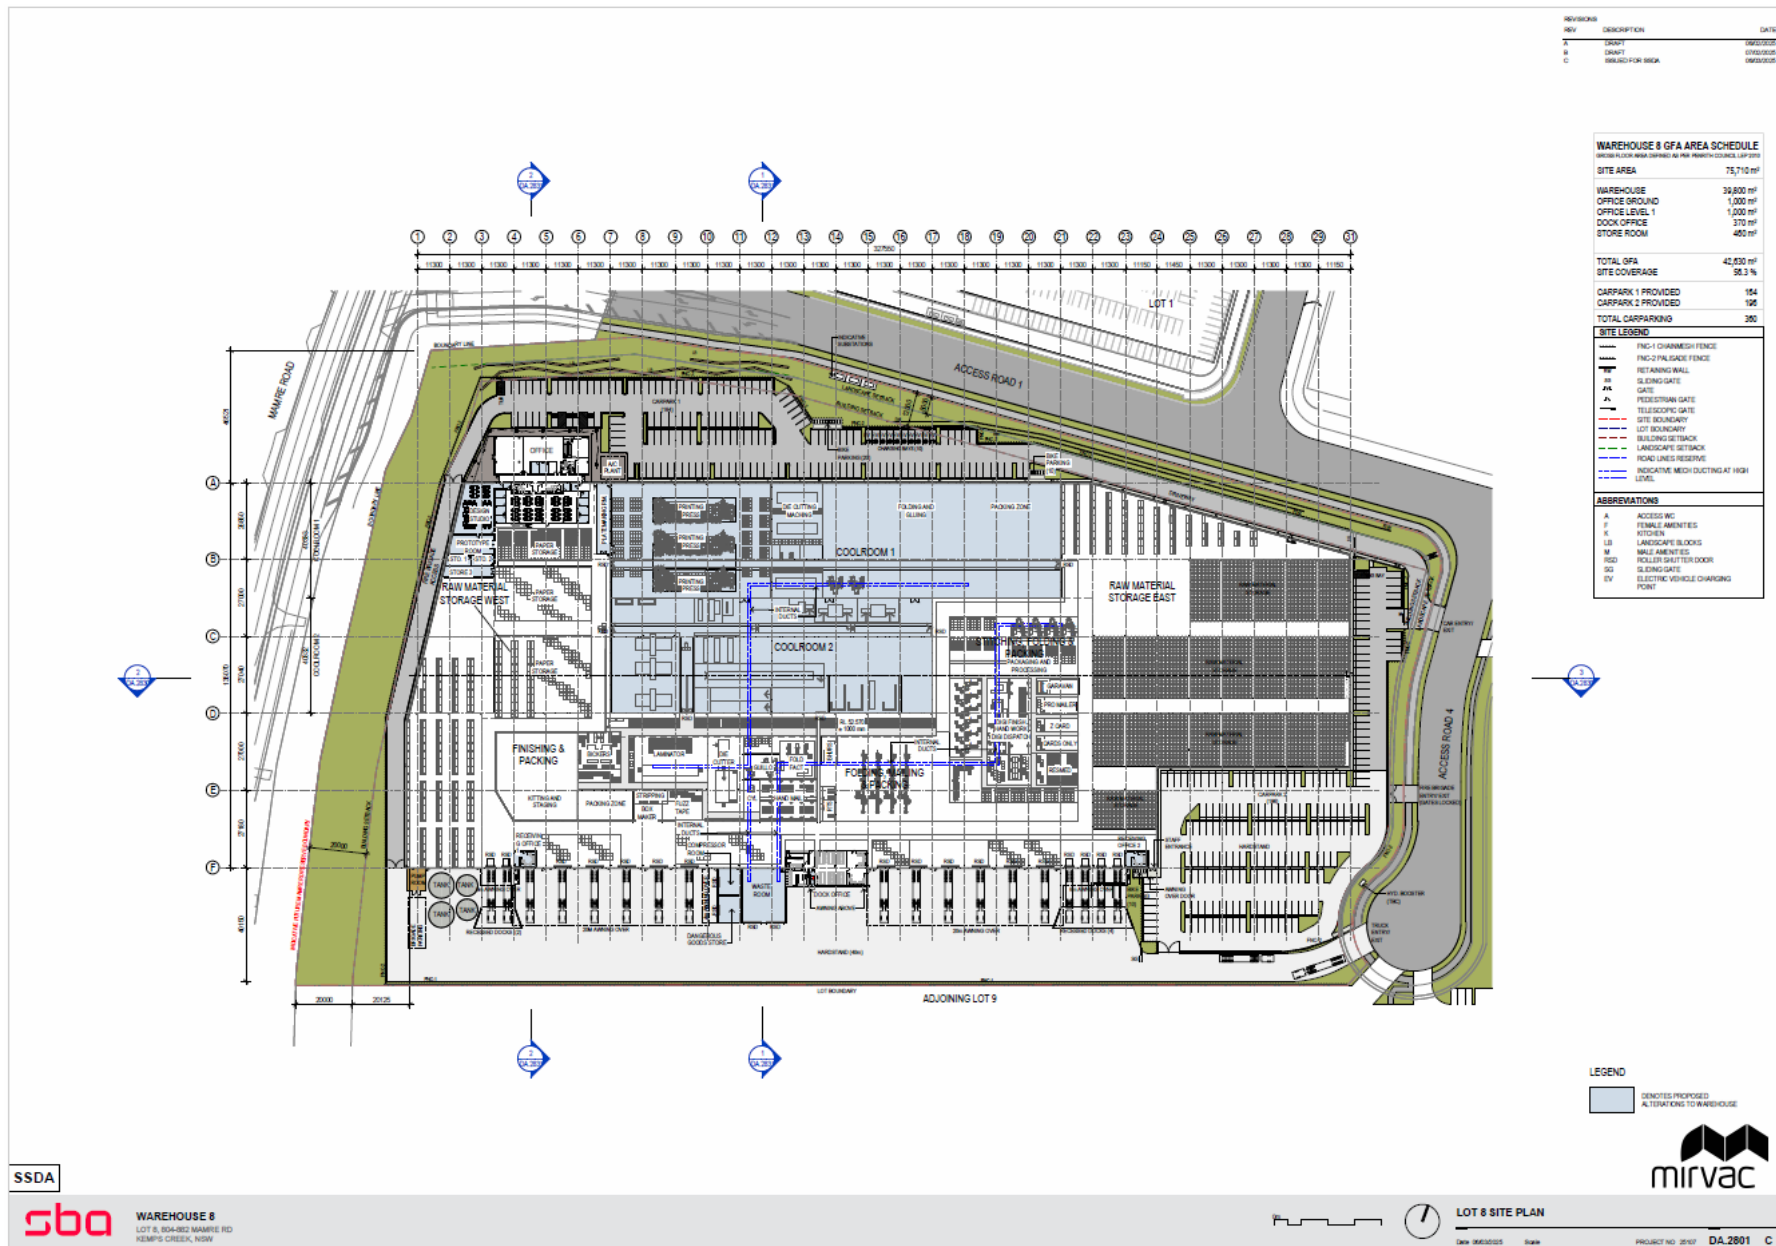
The proposed Warehouse 8 layout (SBA Architects, 2025)
